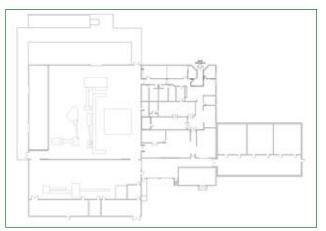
Floor plan of the Tree Seed Centre in Surrey.
